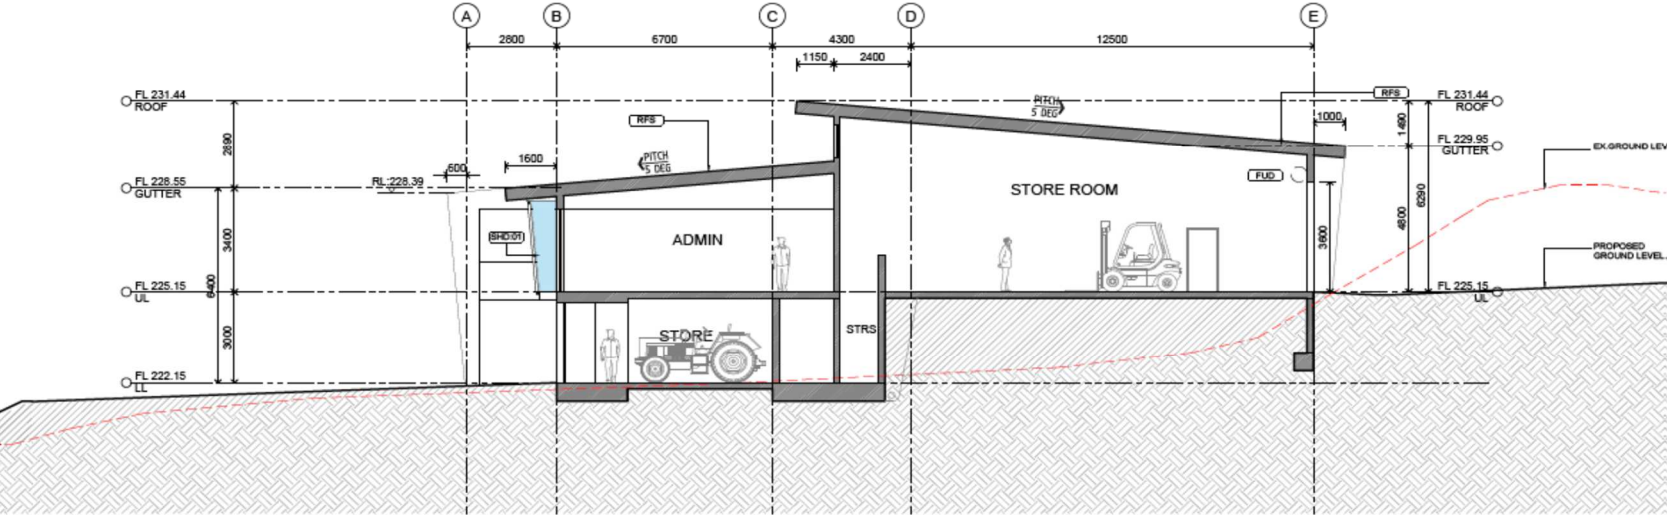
West Elevation and Section of the proposed Community Infrastructure Building.
